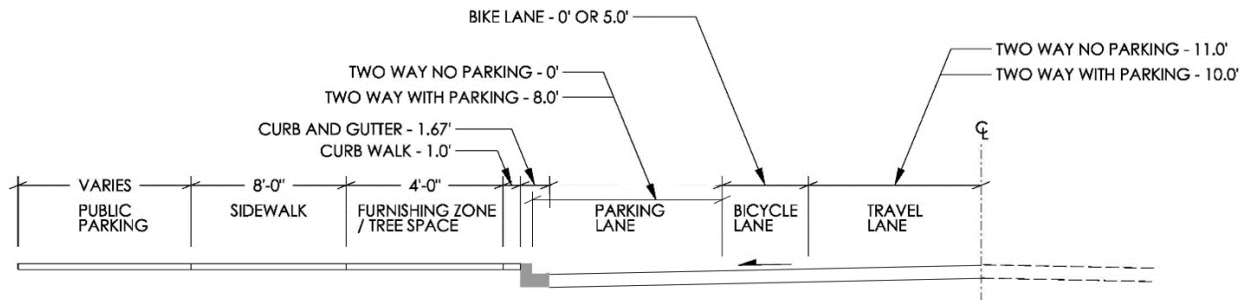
| Example Standard Roadway Element Width Typical Section for New Arterial Streets
